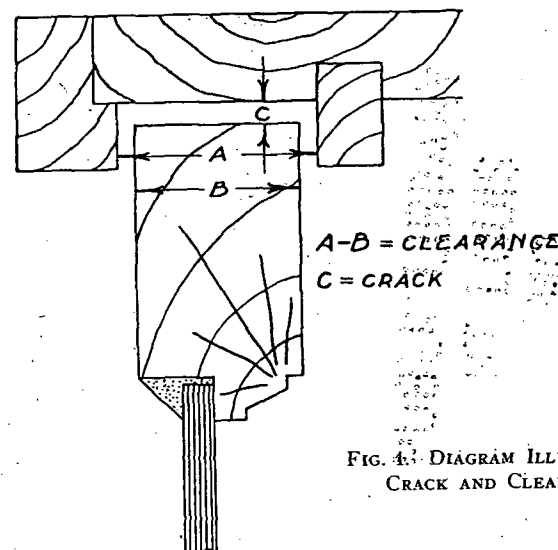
DIAGRAM ILLUSTRATING CRACK AND CLEARANCE
